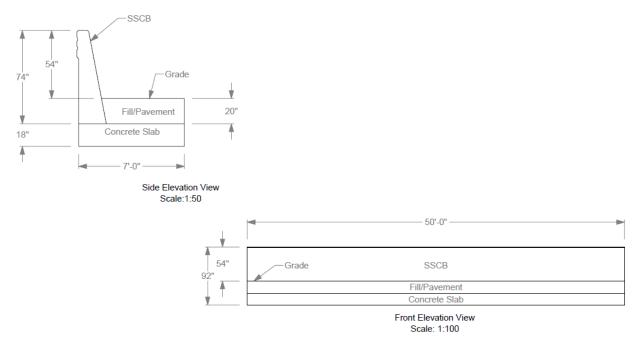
Concept 5 – Moment Slab with Fill/Pavement Overlay Design.
